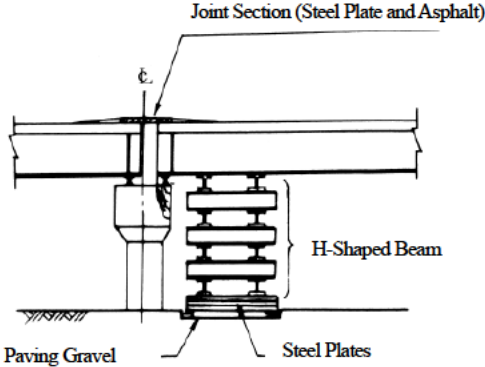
Temporary Support of Girder (Ex.1) Figure 3.4.9 Temporary Support of Girder (Ex.2)
